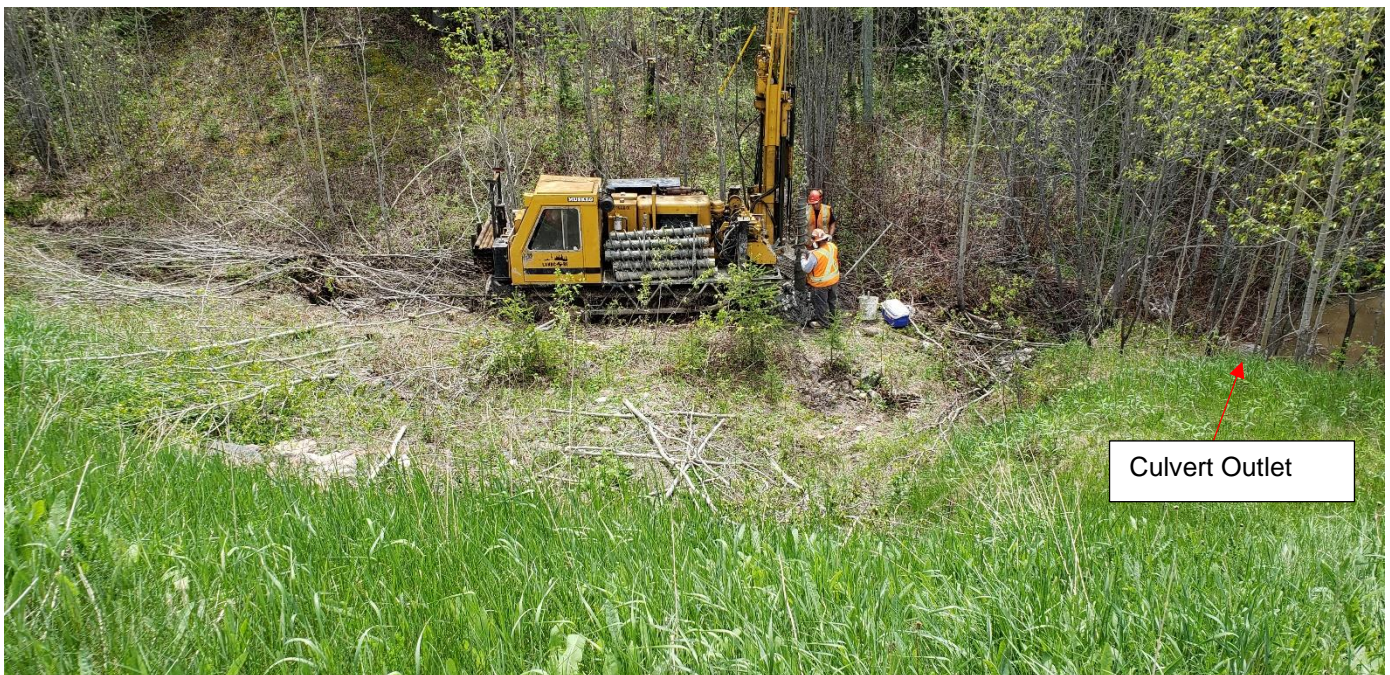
North embankment slope, drill rig set up at Borehole C12-4, looking east (June 2020)
